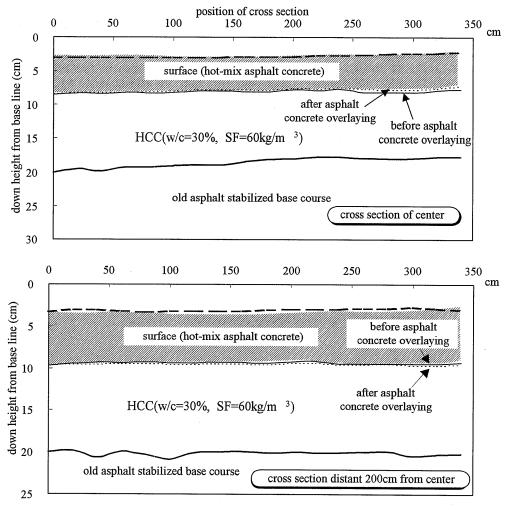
Profile of Cross Section before and after Truck Wheel Traveling
